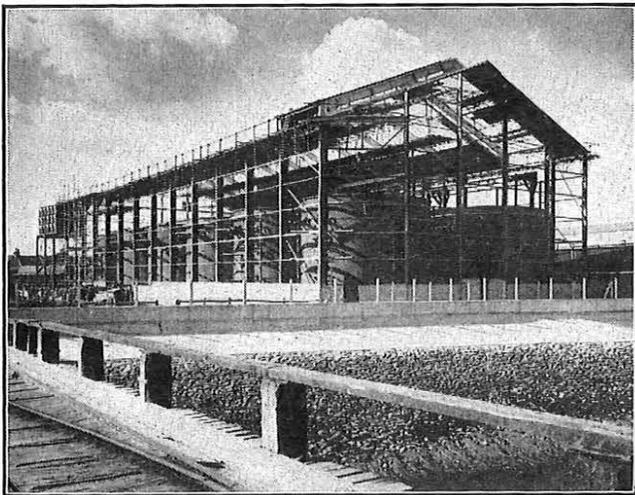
THE TANK HOUSE UNDER CONSTRUCTION.
